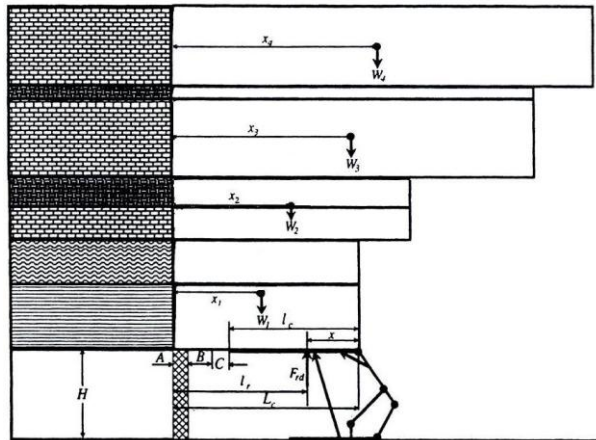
Beam roof loading model (JS Chen et al., 1999; JS Chen and Peng, 1999)
